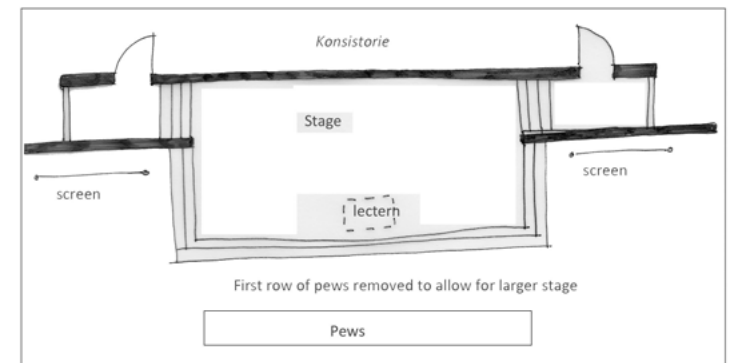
Ground floor plan (Le Roux documentation 1979, Kopsiekerk archive)
